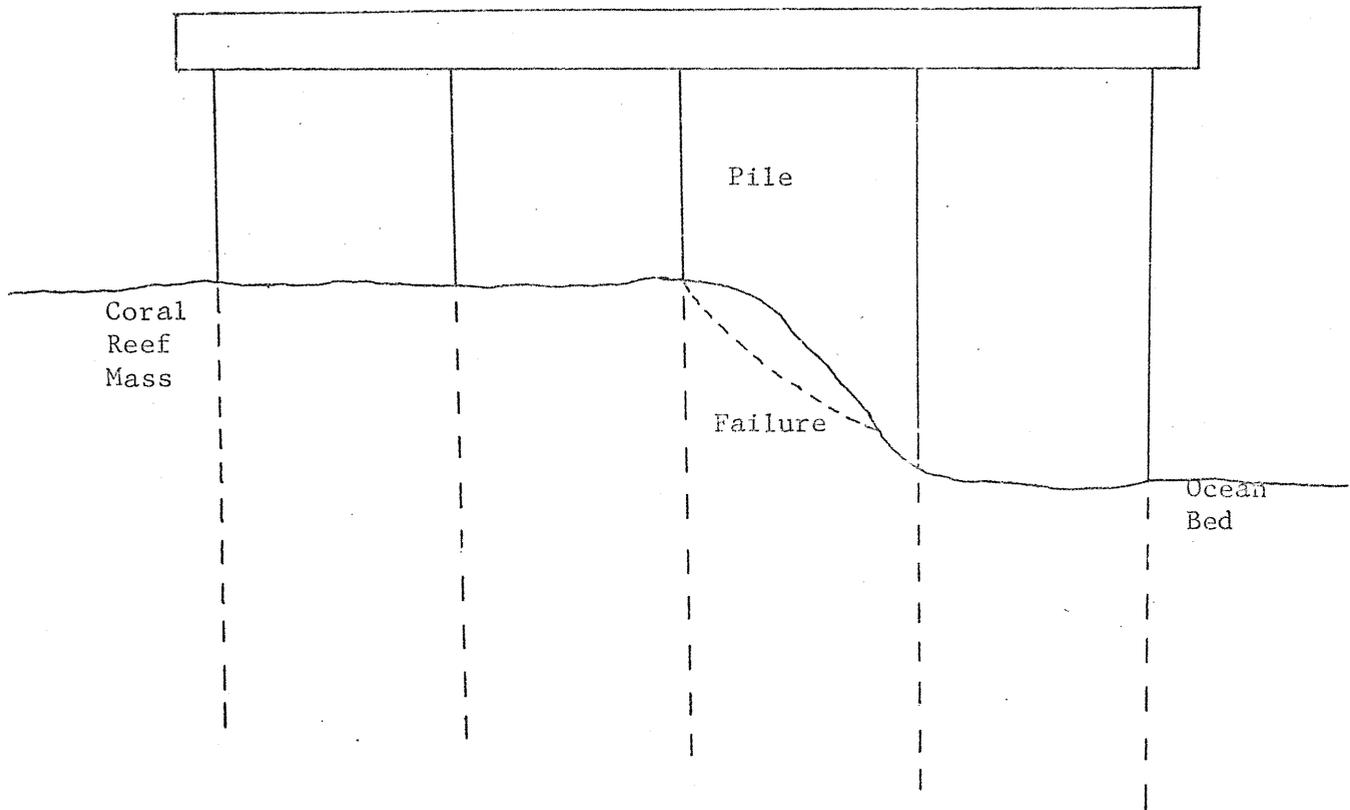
a. Localised Failure occurs due to Pile Driving
